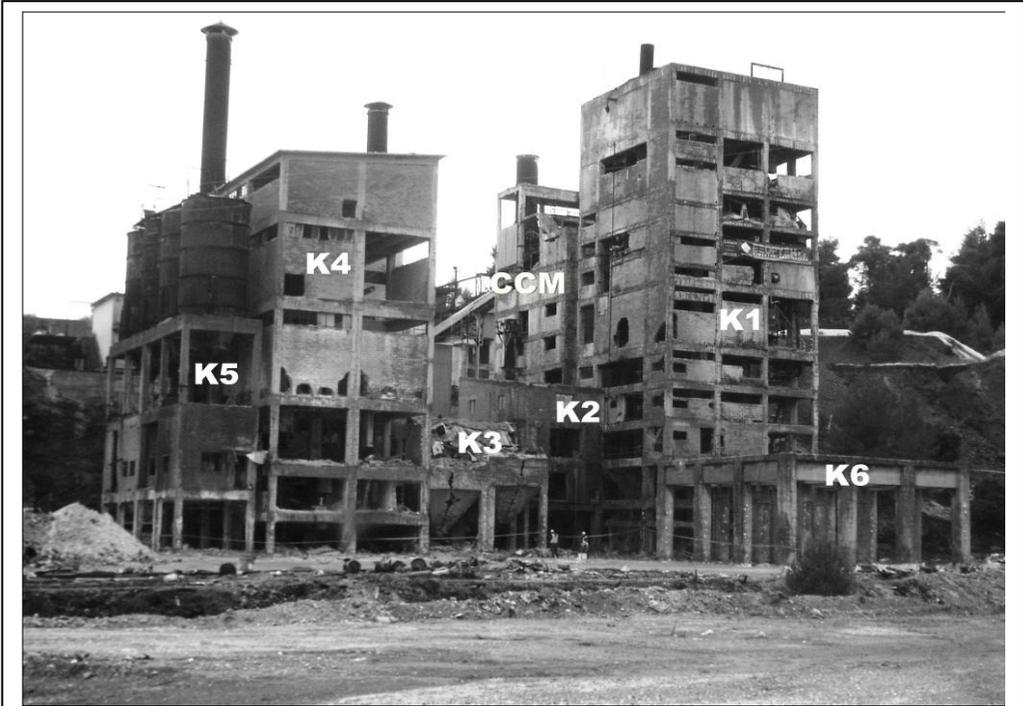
The 6 buildings with their coding. The CCM building had to be protected.
